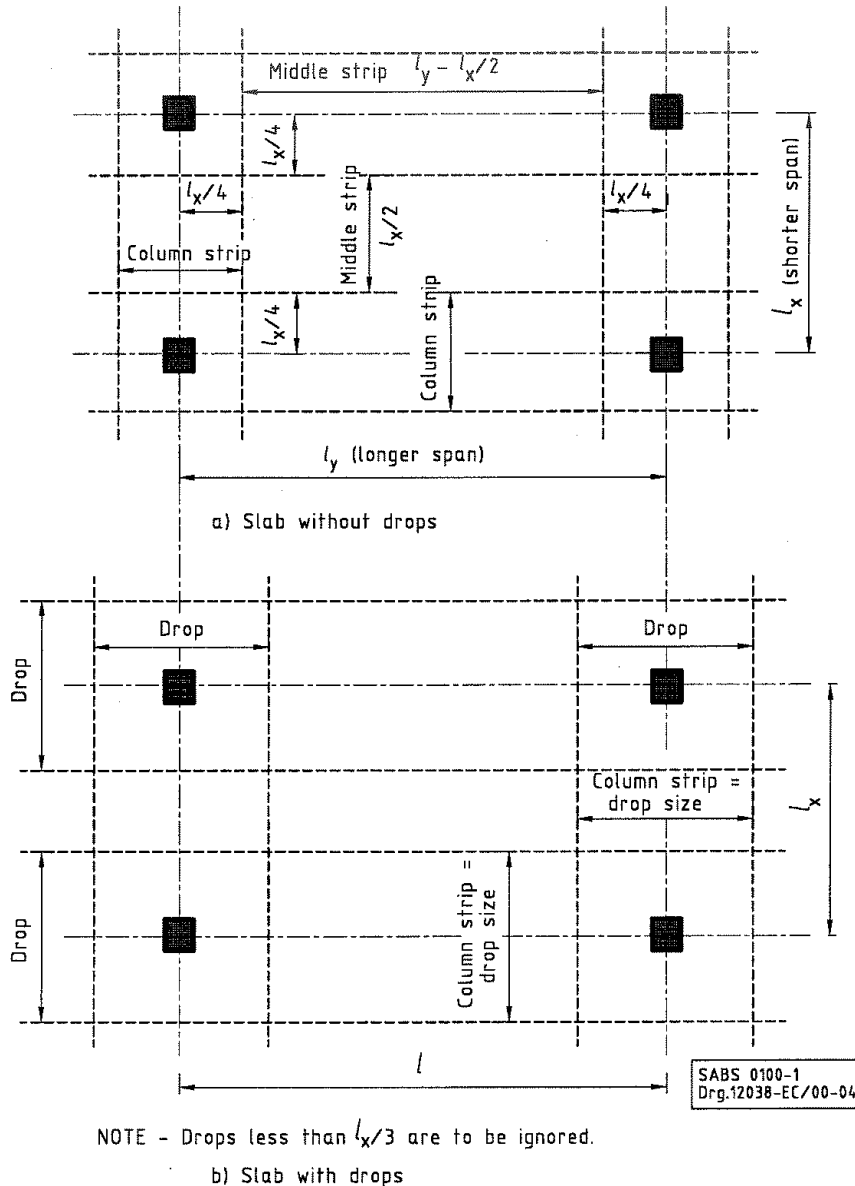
Division of flat slab panels into column and middle strips -- SANS 10100
